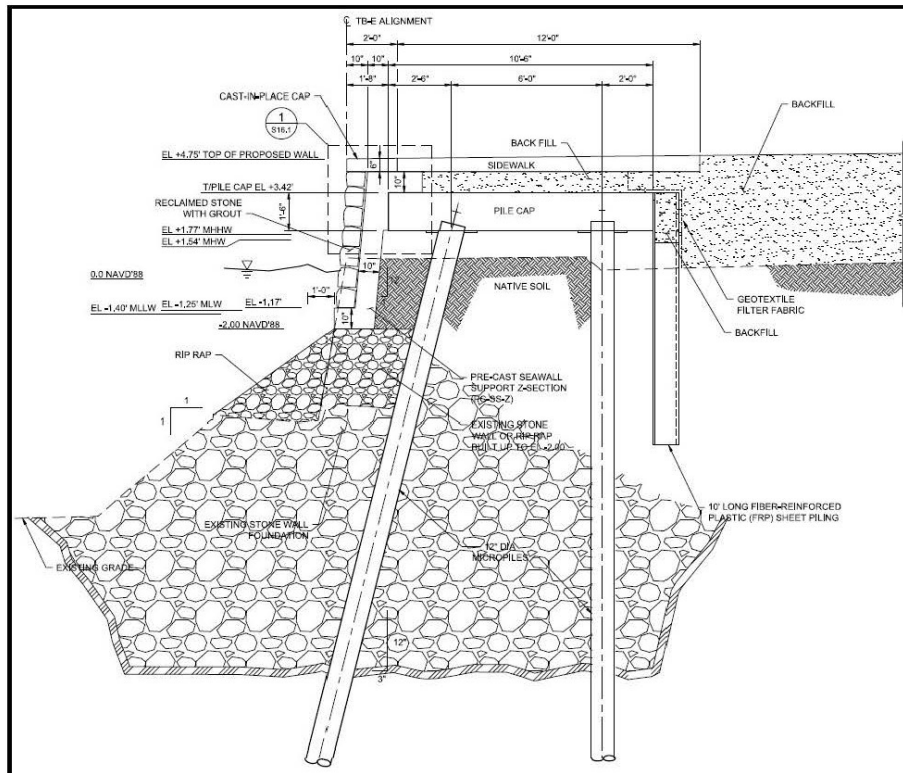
Tidal Basin West – Proposed Seawall Section (Typical)
